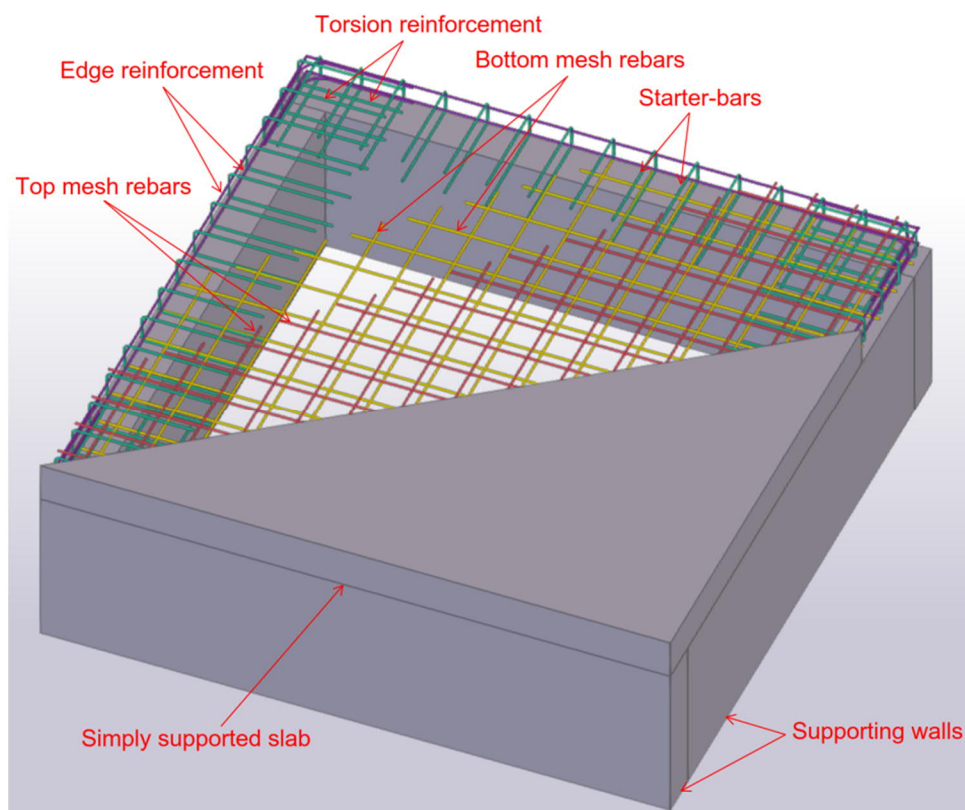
Example of slab reinforcement (Tekla Structures model snapshot)
